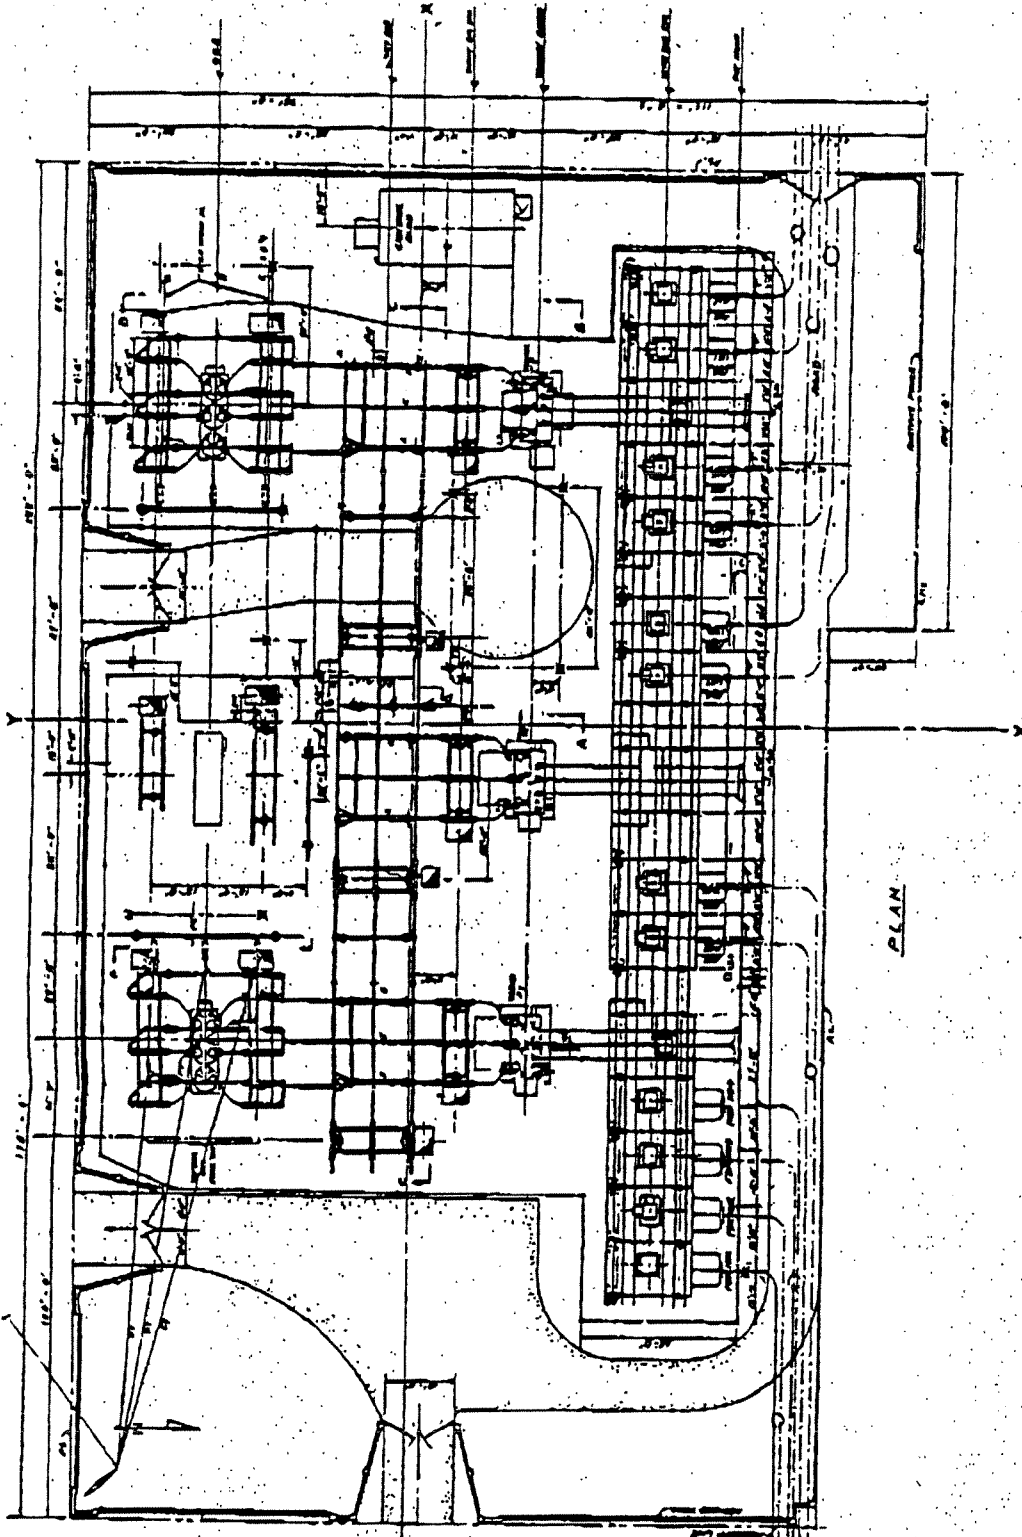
TYPICAL DISTRIBUTION SUBSTATION PLAN VIEW
